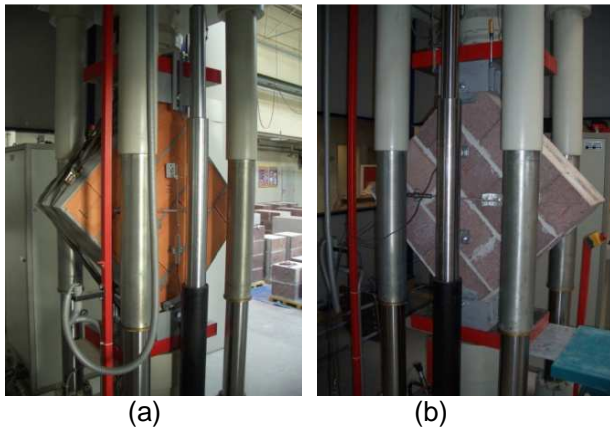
Example of diagonal tension test set-up: (a) clay and (b) lightweight concrete masonry
